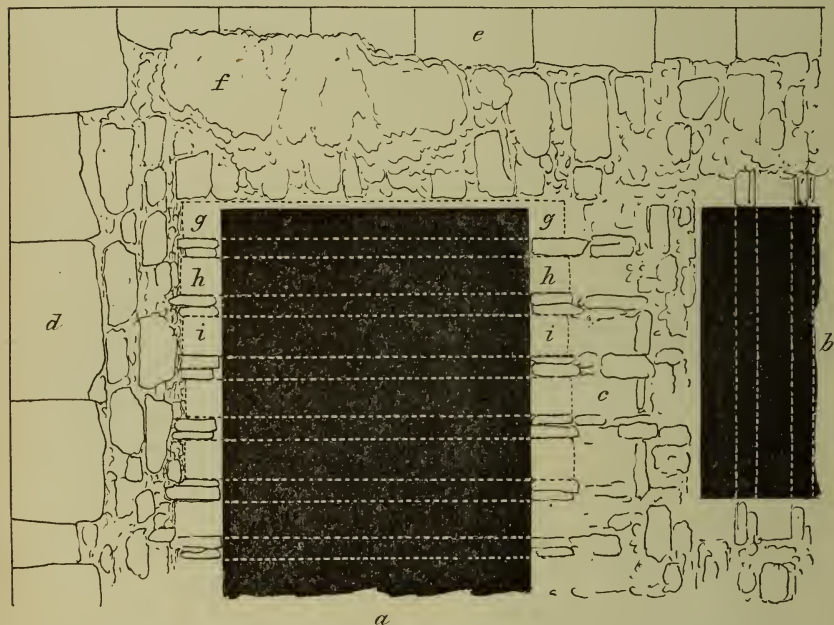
PLAN OF NORTHWEST CORNER OF QUADRANGLE OF THE GRECQUES, SHOWING THICKNESS OF WALLS AND PLACEMENT OF CEILING BEAMS.
